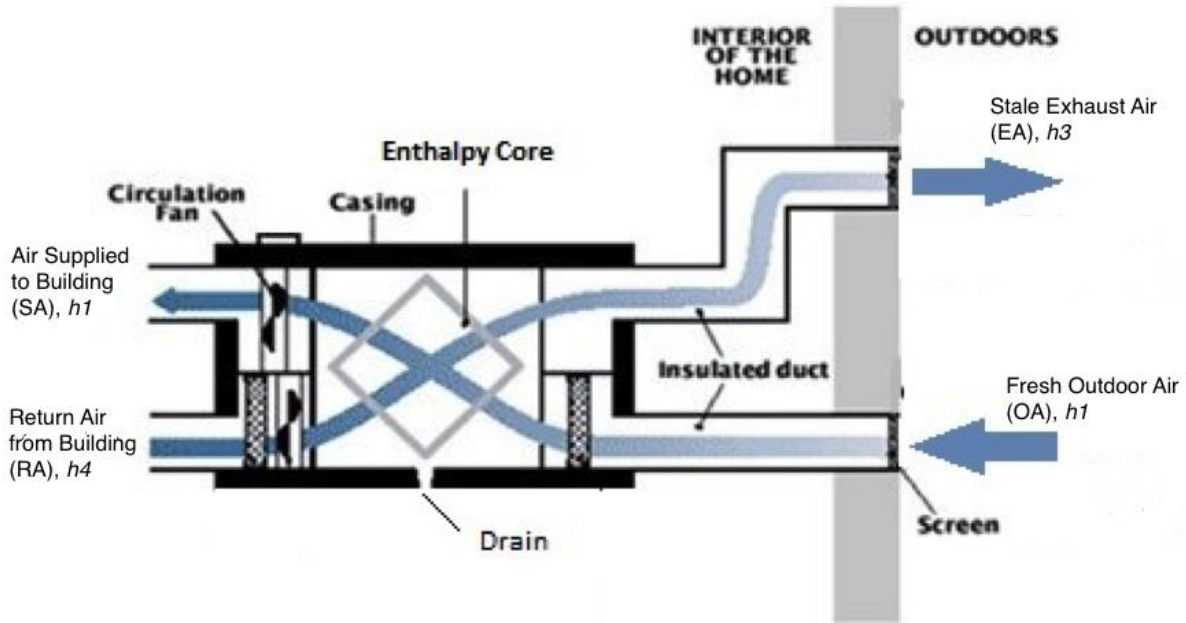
HERV Installation - Adapted (Mara Air, 2014)
